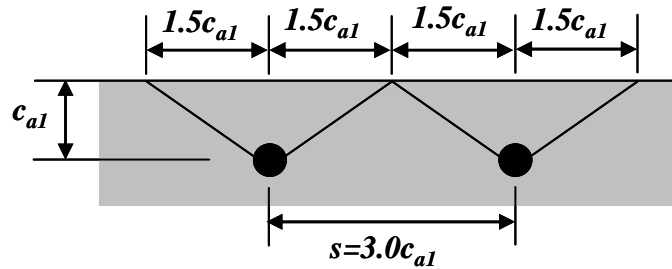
Two anchor arrangement displays the minimum spacing such that no overlap of the failure cones occurs
